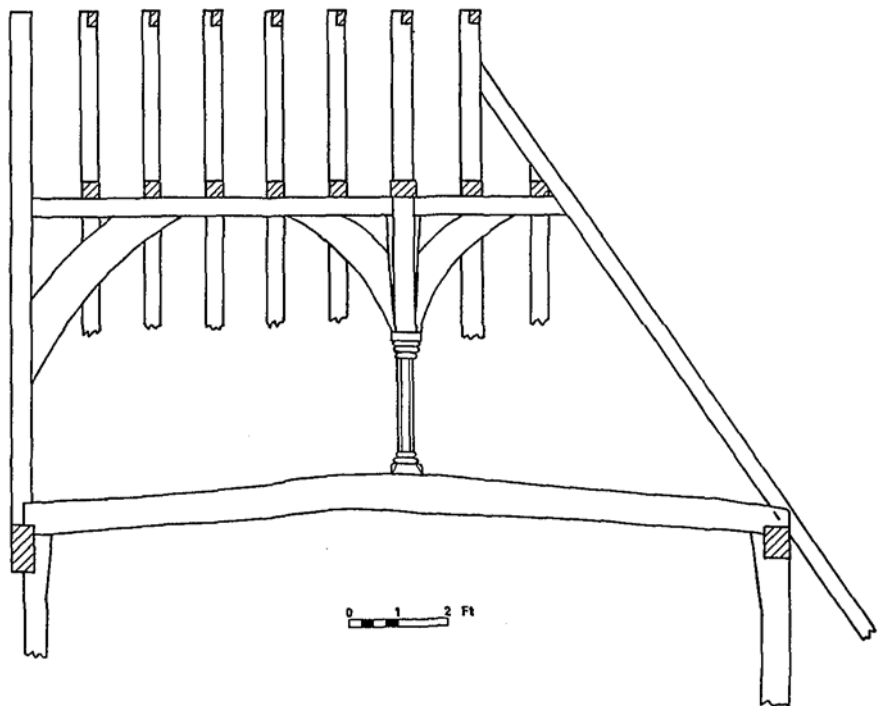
Construction of roof showing sloping hip at rear of premises, with collar purlin and tie-beam at right-angles to gable facing the street.
